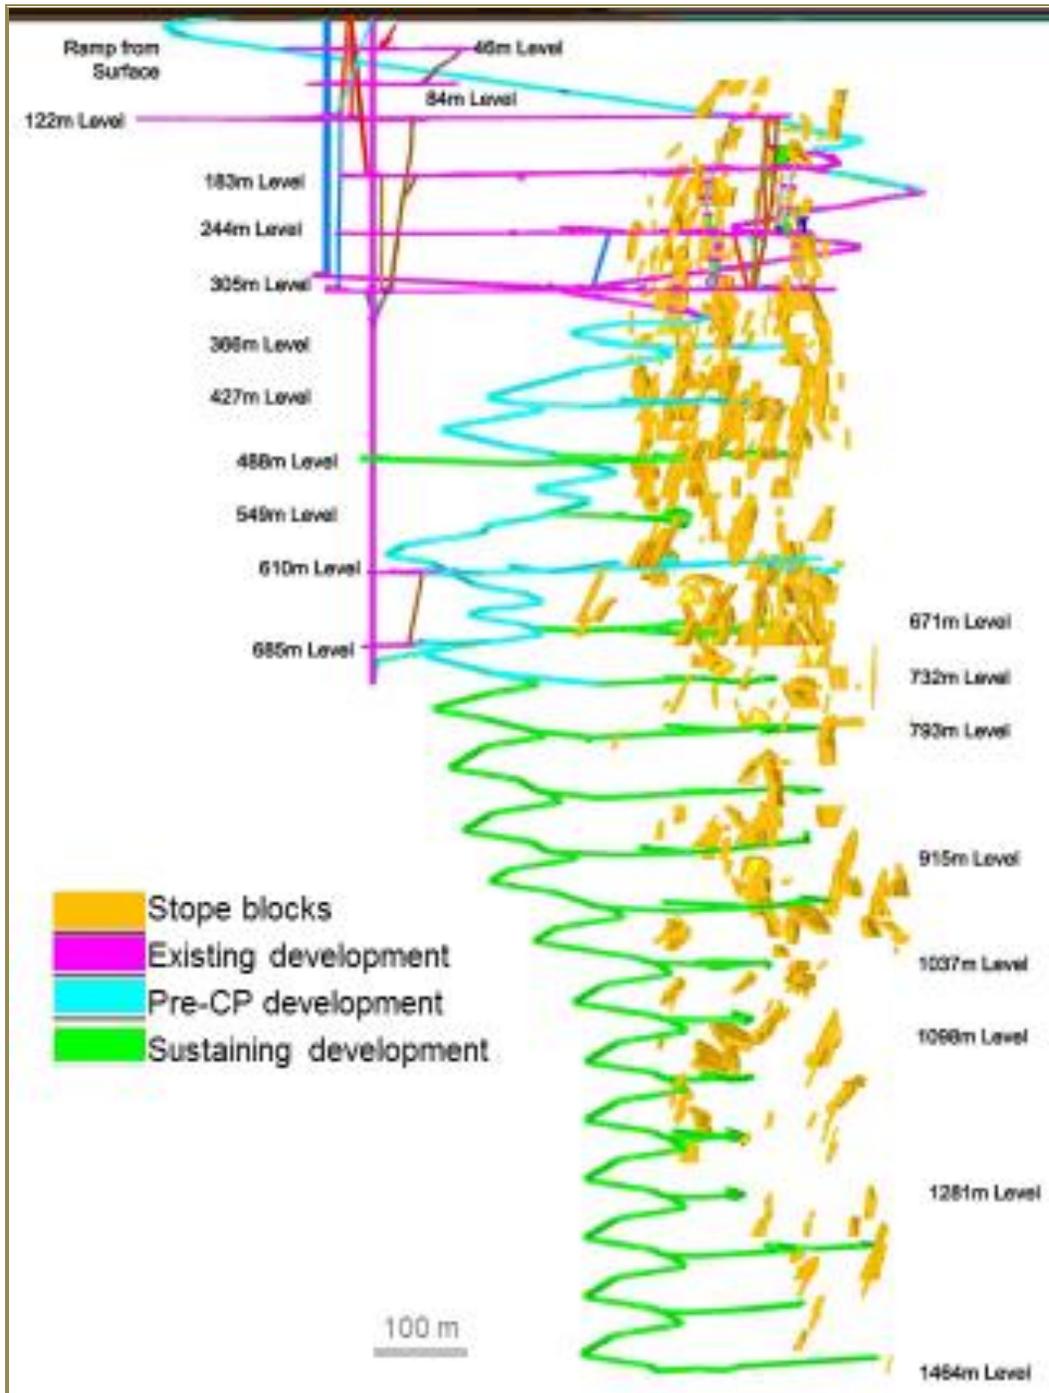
Phoenix LOM Development Plan 3D Isometric, Looking North, (Rubicon, 2019)
